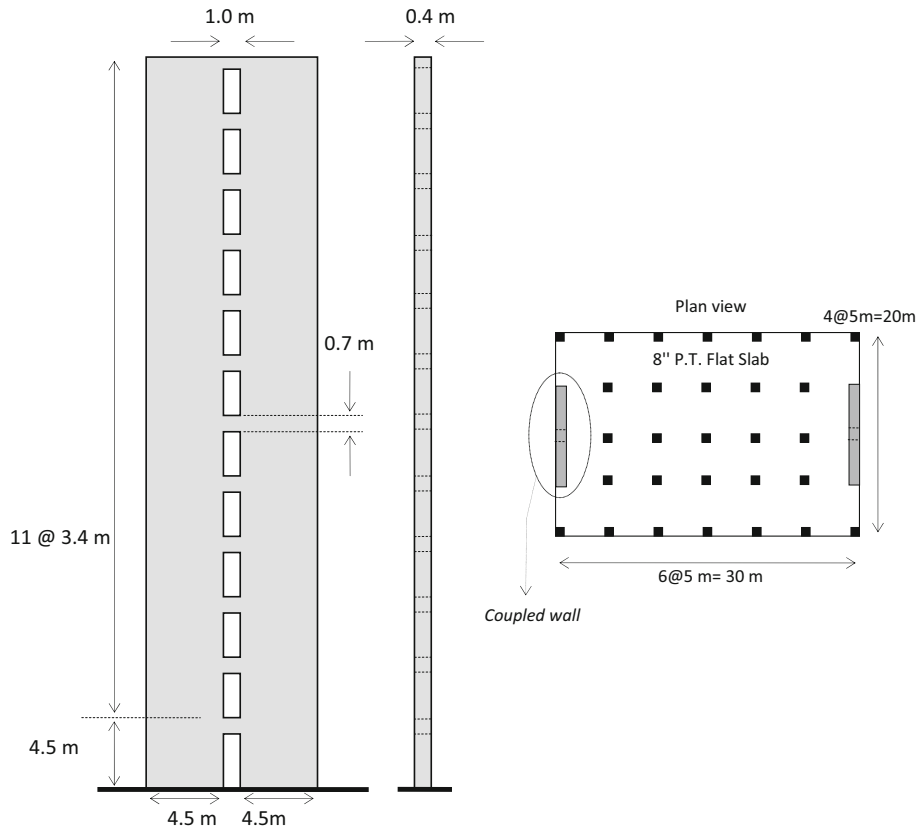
Elevation of 12-story building, and floor plan applicable to 8, 12, and 20-story buildings.
